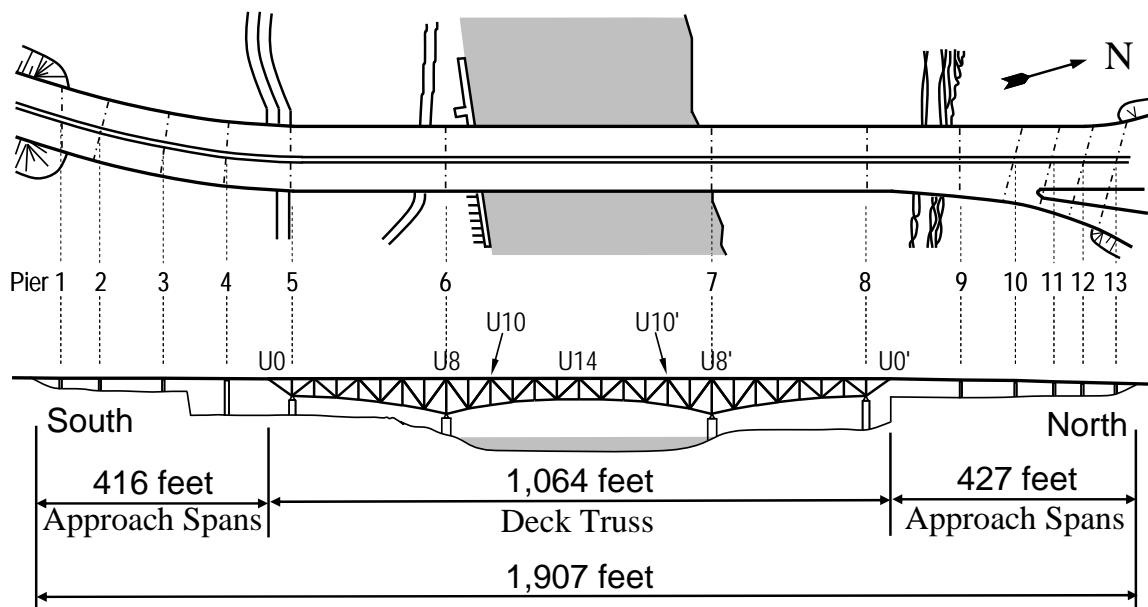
Plan and elevation view of I-35W Bridge (based on Mn/DOT 2008).
